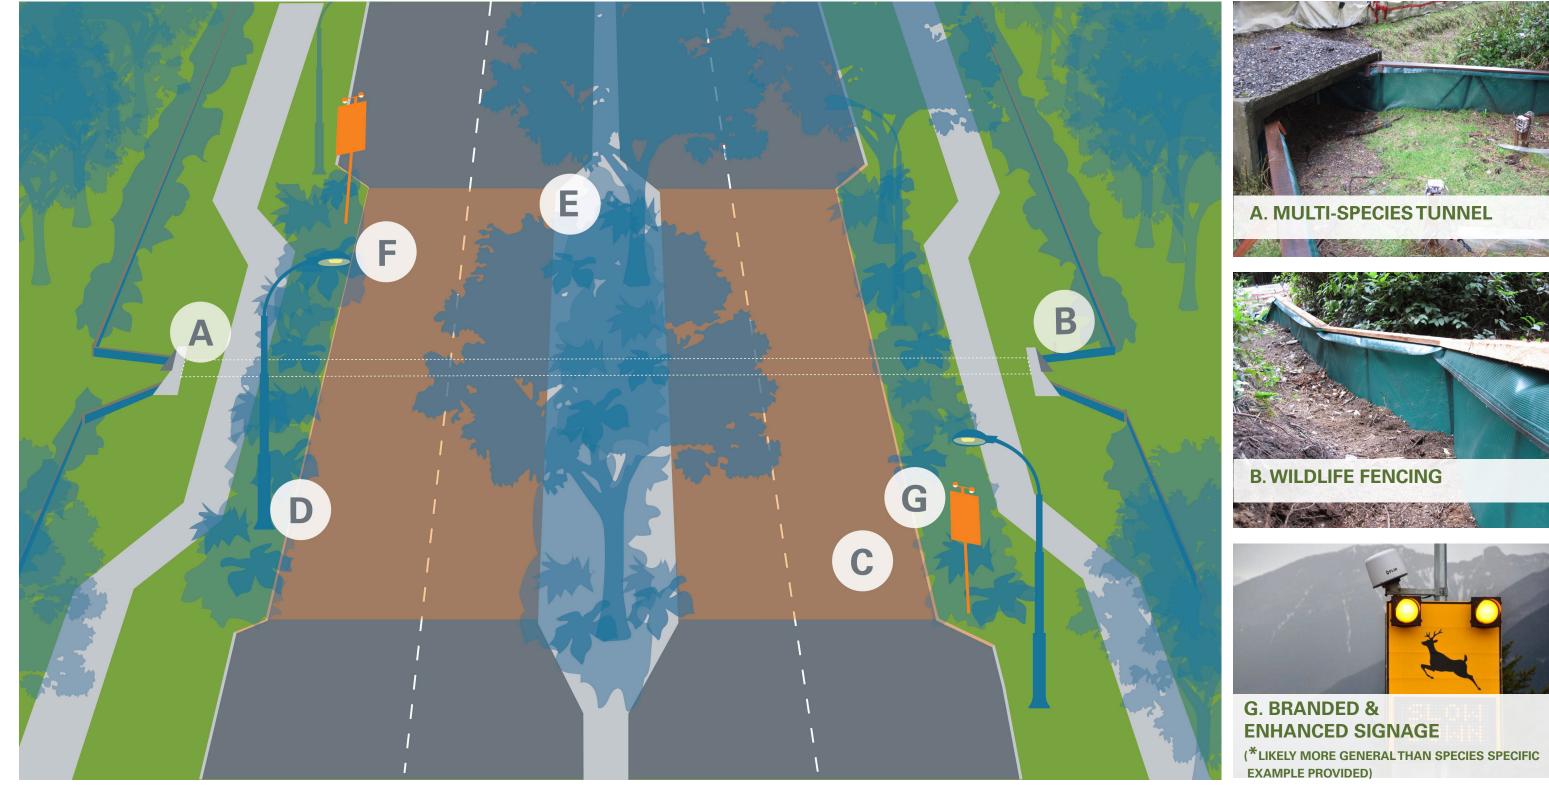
ARTERIAL ROAD - TERRESTRIAL CROSSING
